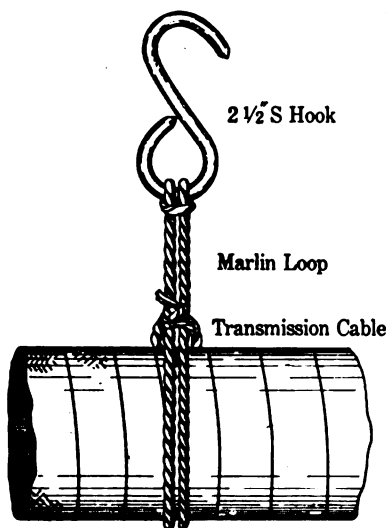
METHOD OF FASTENING S HOOKS TO AERIAL CABLE
